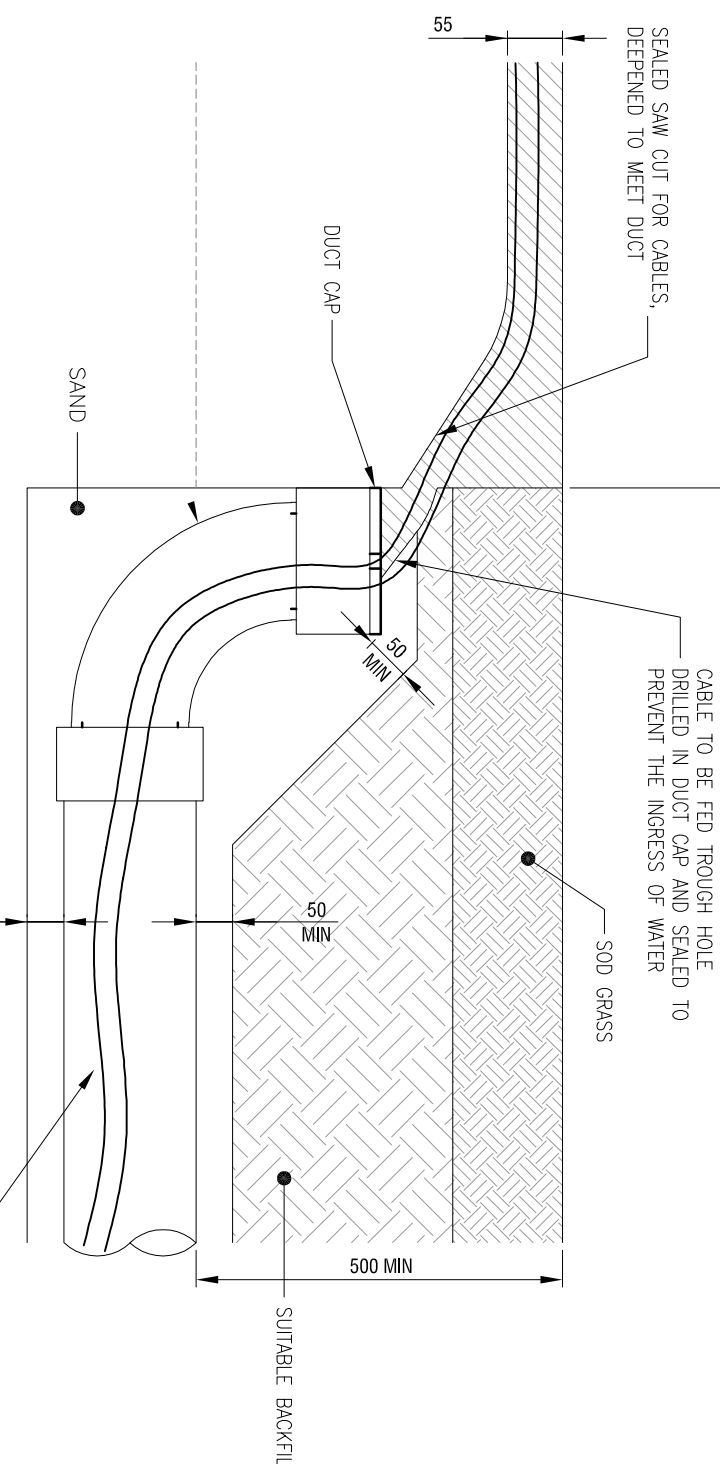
DETAIL OF INSET AND ELEVATED LIGHT FED VIA SAN CUT
